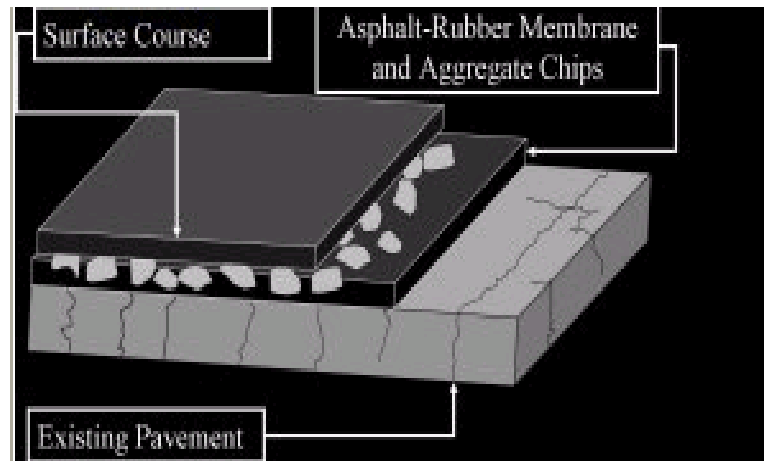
Typical Layout of S.A.M.I (ARTS 2002)
